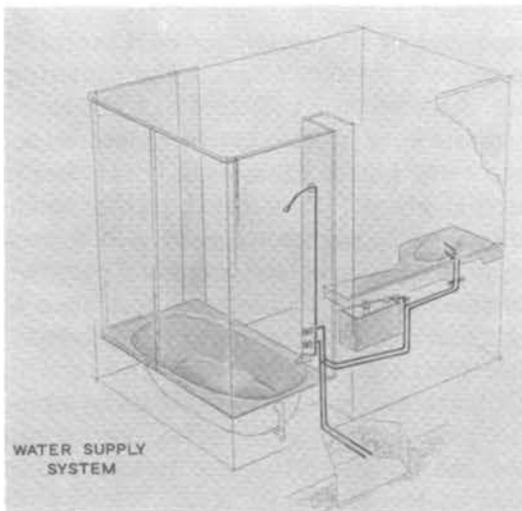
Tub and walls to be added to lavatory-water closet component.
